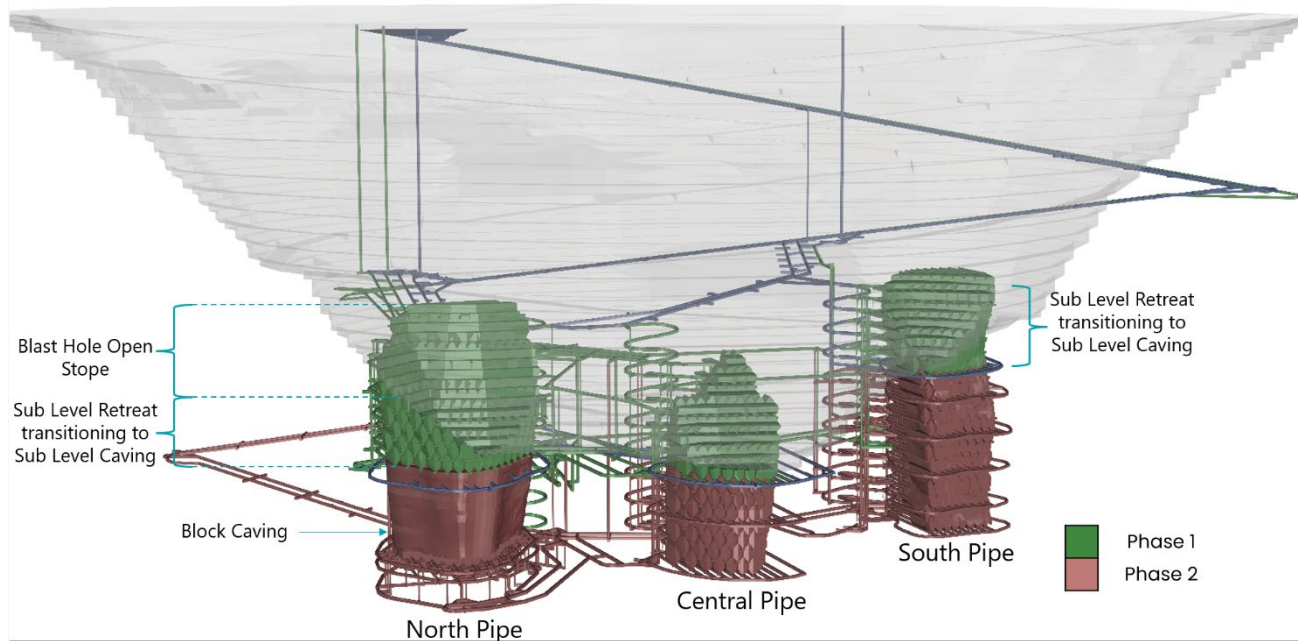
Mining layout for Jwaneng underground project, showing final pit shell
